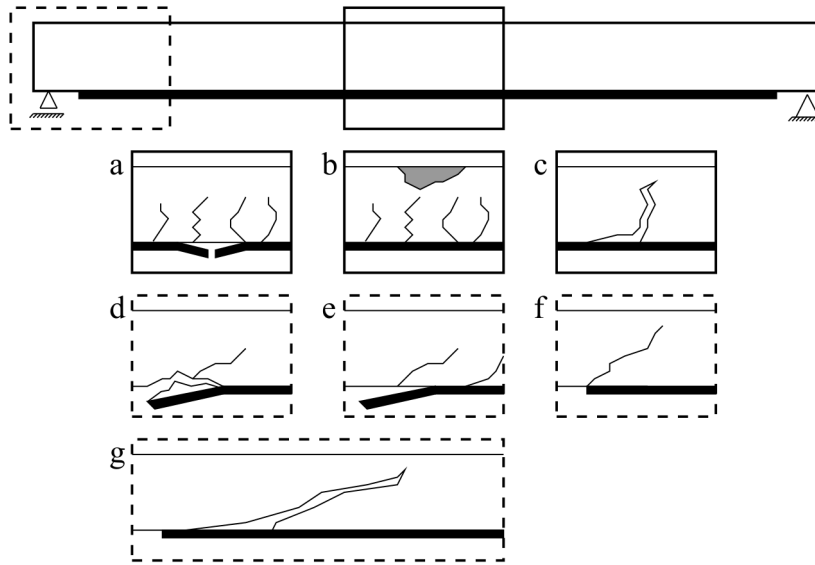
Failure modes of RC beams strengthened with FRP: (a) tensile failure of FRP, (b) concrete crushing, (c) intermediate crack induced interfacial debonding, (d) peel on concrete cover, (e) interfacial debonding, (f) shear failure; and (g) critical diagonal crack (Ceci et al., 2012).
